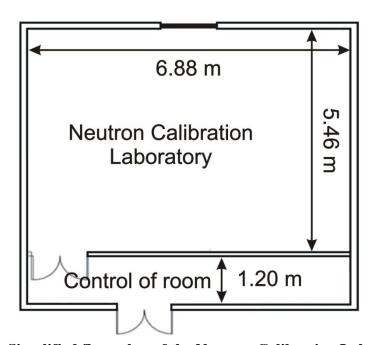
Simplified floor plan of the Neutron Calibration Laboratory.
